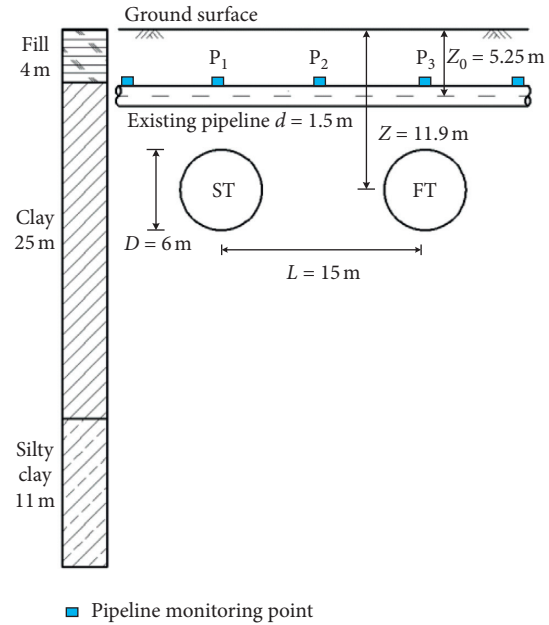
Profile of twin-tunnel crossing existing pipeline.
